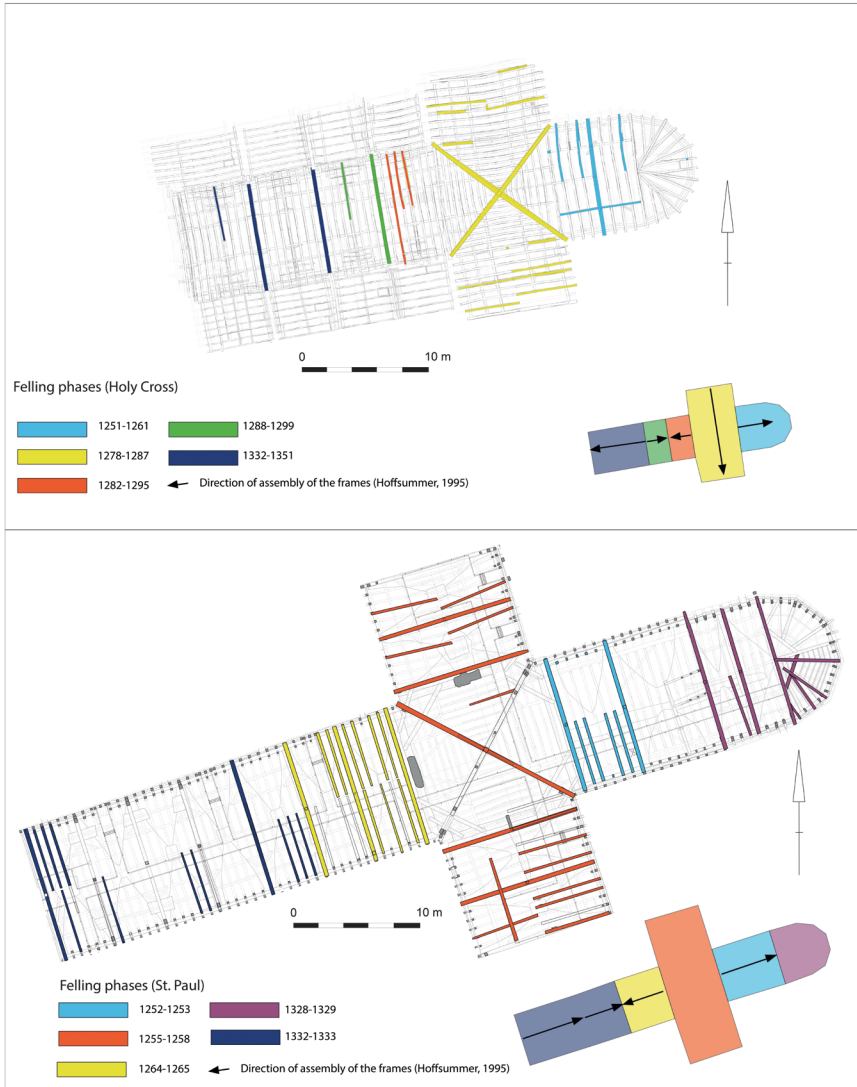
Timber felling phases superimposed on construction phases. Floor plans: AA/TGI, pHD, E.Pallot, AWAP and Uliege.
